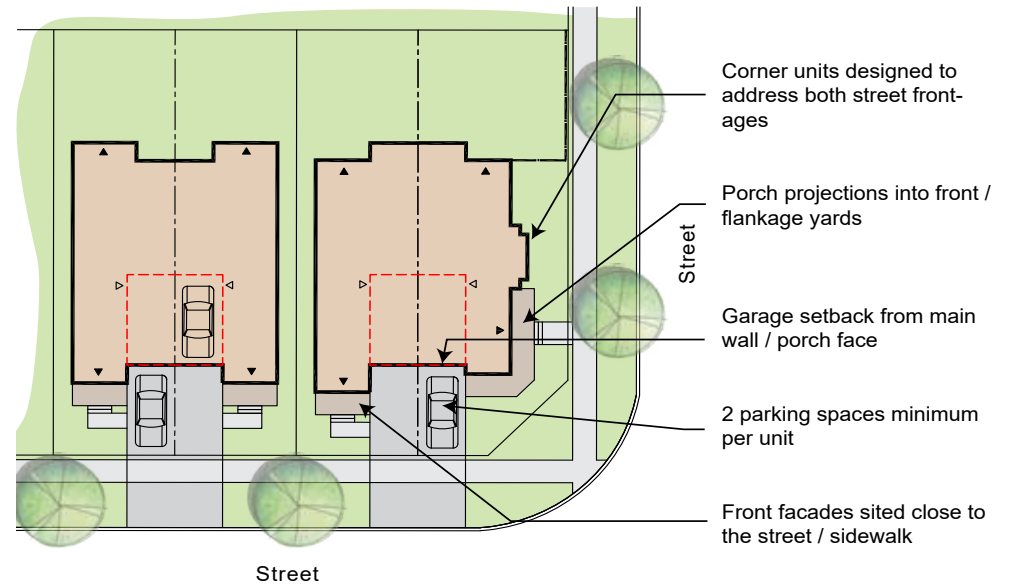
Conceptual Siting of Semi-Detached Dwellings
